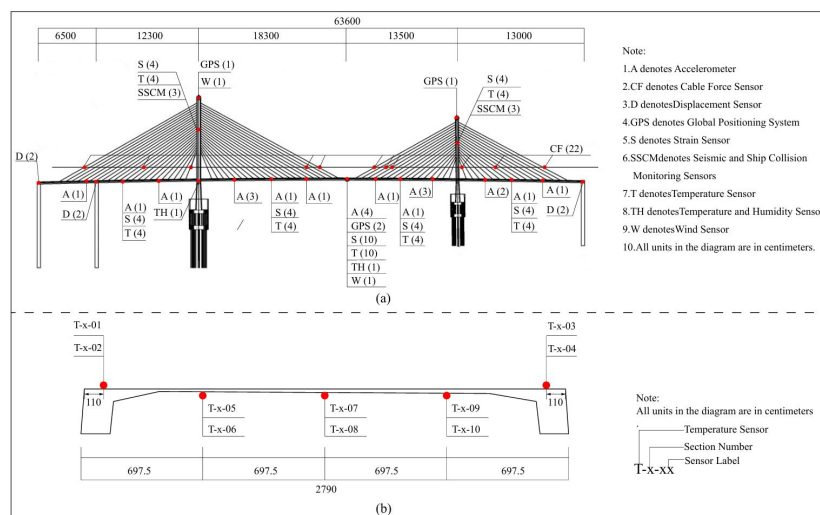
Structural configuration and sensor layout of the Poyang Lake Bridge
